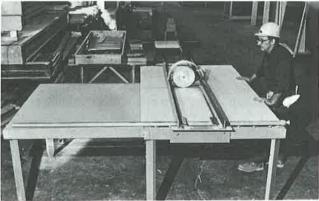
A table-mounted power slitter such as this one will simplify cutting gypsum board. Slitters can be built which will cut both surfaces of the gypsum board simultaneously.
